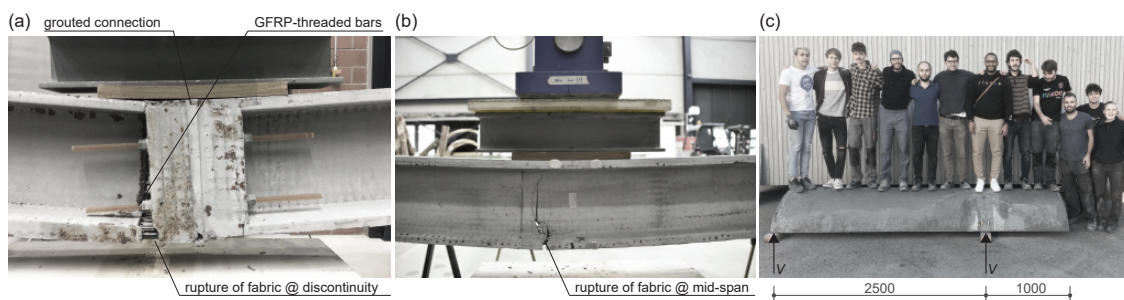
Tests of pavilion elements: (a) anchorage failure of the connection; (b) bending failure of the beam, and (c) test of the barrel-shell vault.
